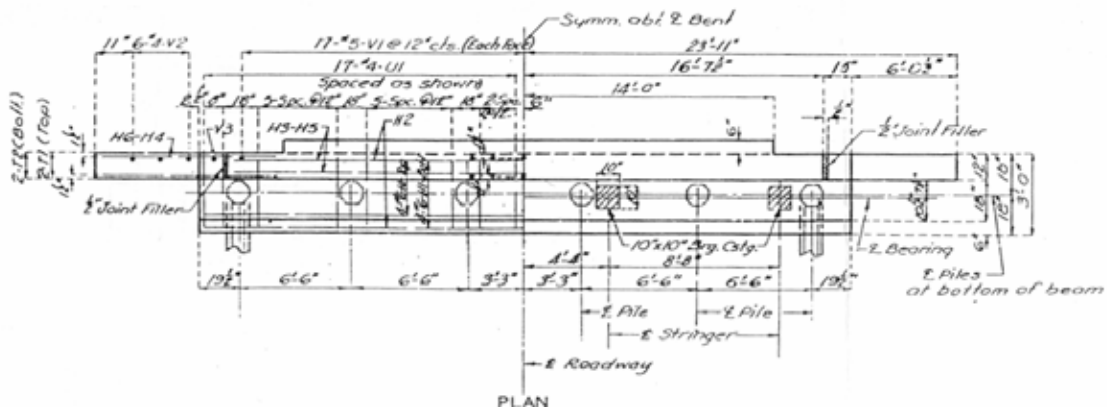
Plan of Old Wahite Ditch Bridge Abutment
